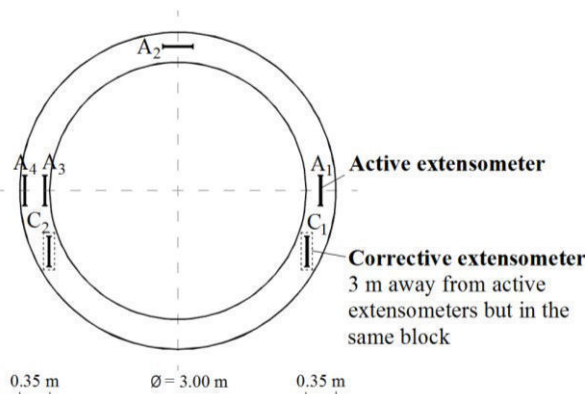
Disposal of Carlson extensometers into the concrete lining, in the instrumented section.
